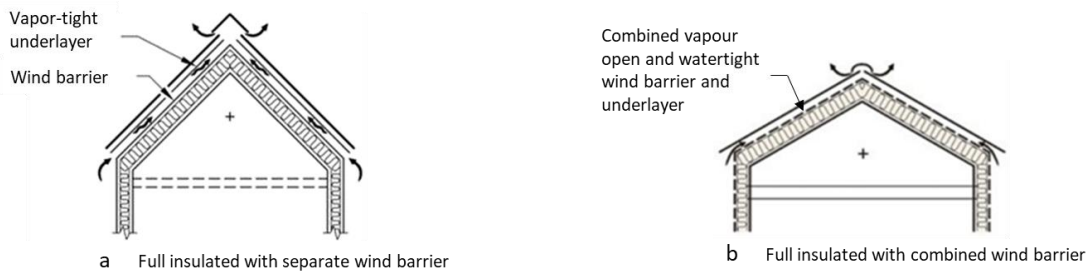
Roof with full insulation. (a) A roof separates the rain and wind barrier. (b) An insulated roof with vapor opens combined wind barrier and underlayer roof. All ventilation of the roof takes place in the air cavity below the roofing. (Gullbrekken, 2018).
